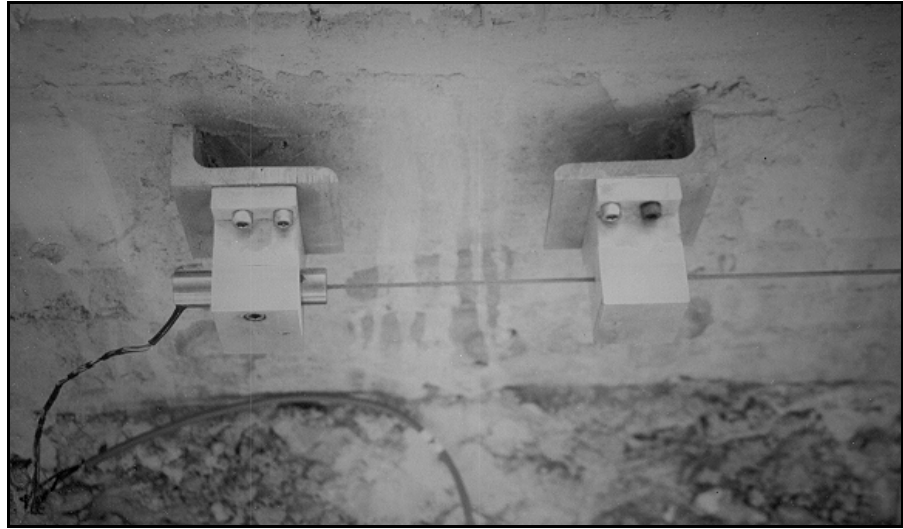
An LVDT Installed on the West Edge Side at Sawcut 27 to Measure Crack Opening Width.
